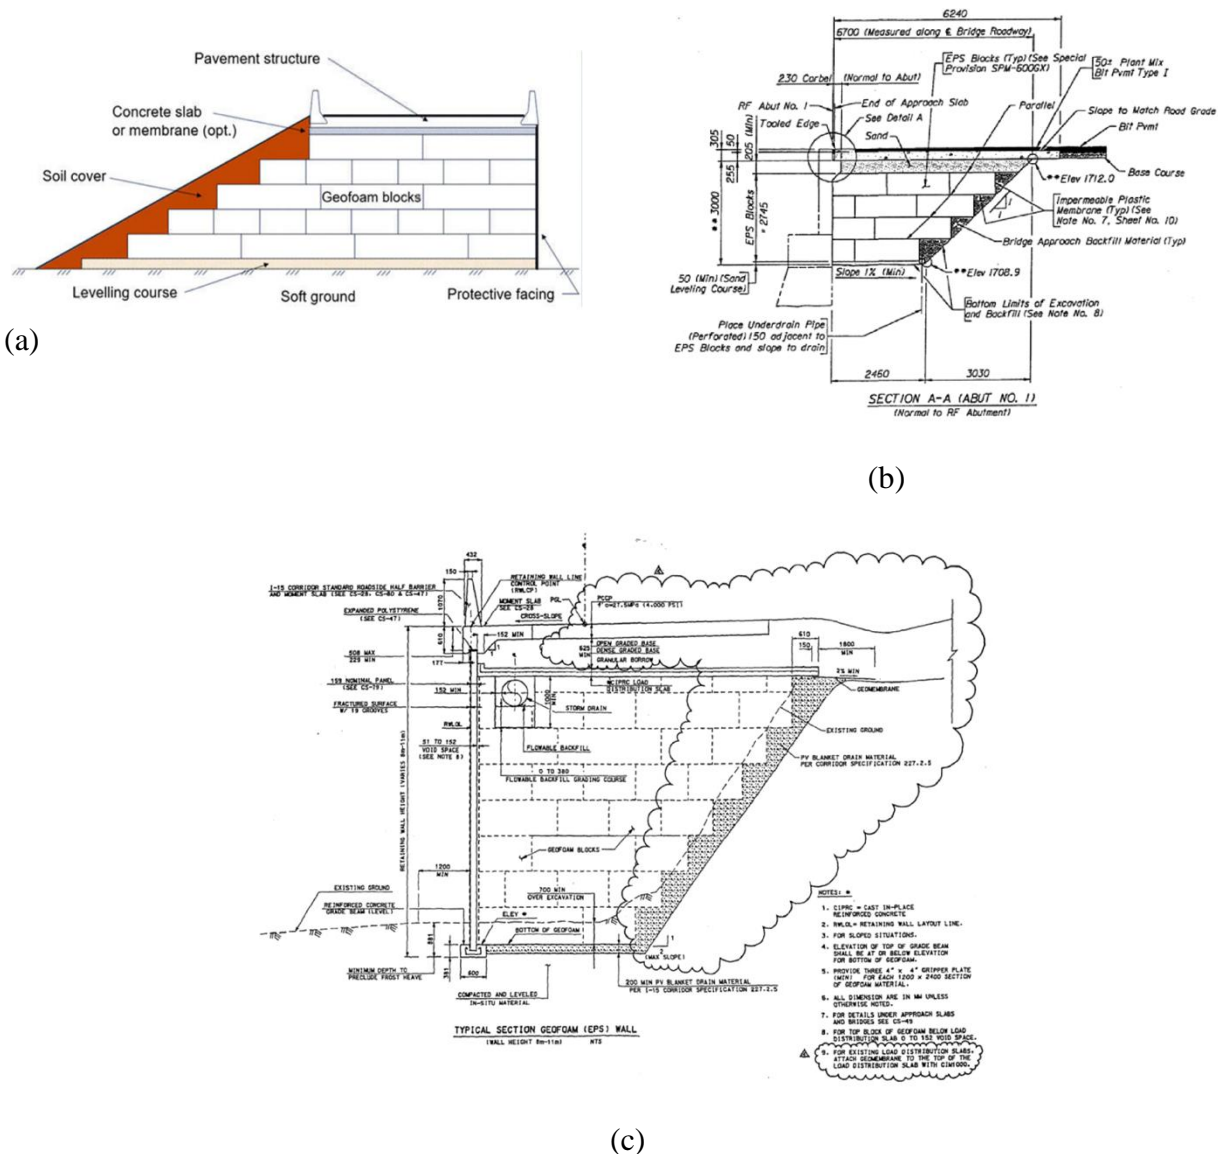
(a) Typical cross section of Embankment using EPS blocks (Aabøe et al. 2019), (b) Typical cross section of Abutment using EPS blocks (Right) (Stark et al. 2004), (c) Typical cross section of Retaining Wall using EPS blocks (Stark et al. 2004).
